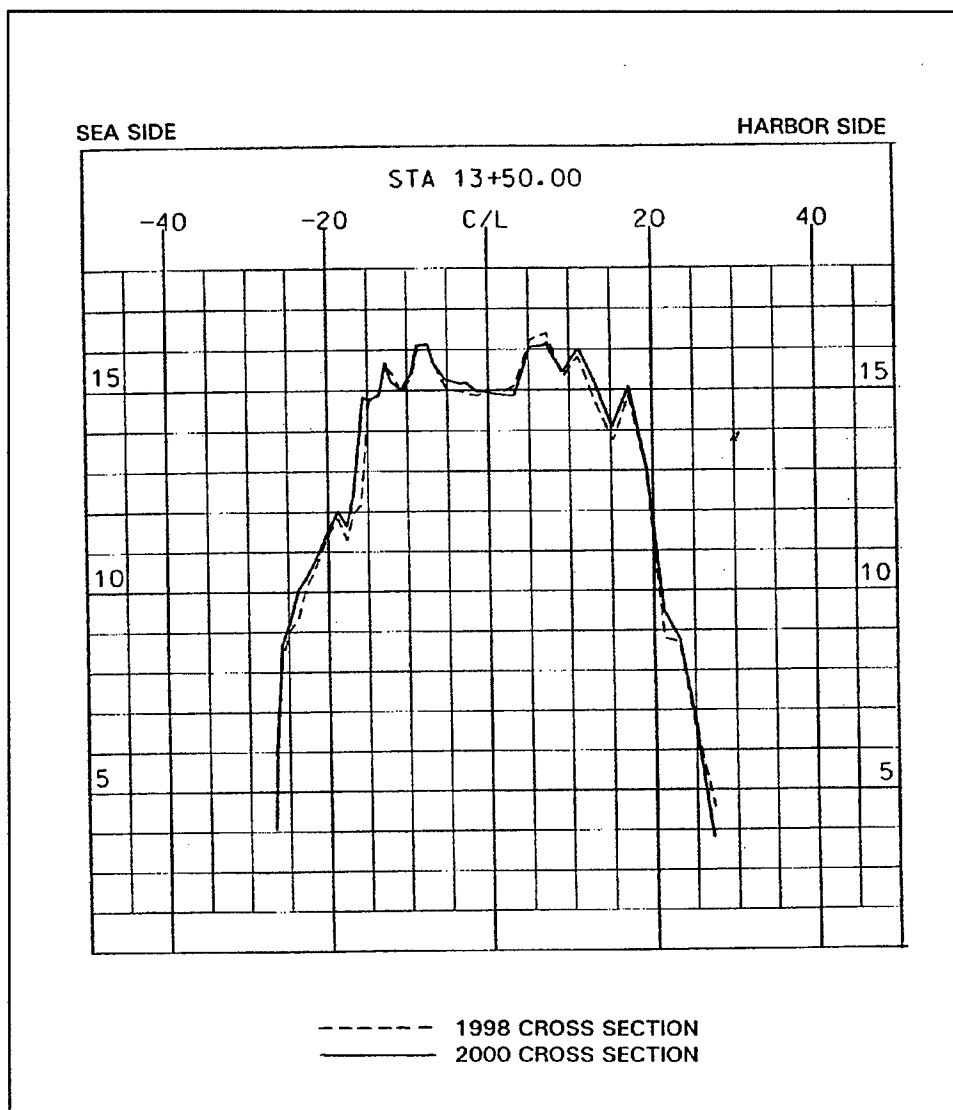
Cross sections of Morro Bay outer south breakwater, sta 13+50
